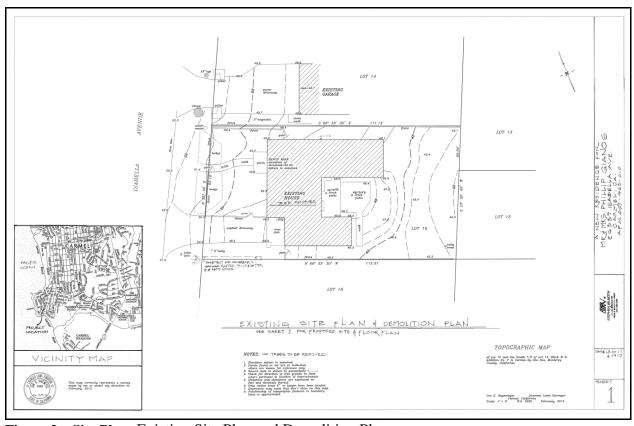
Site Plan: Existing Site Plan and Demolition Plan
